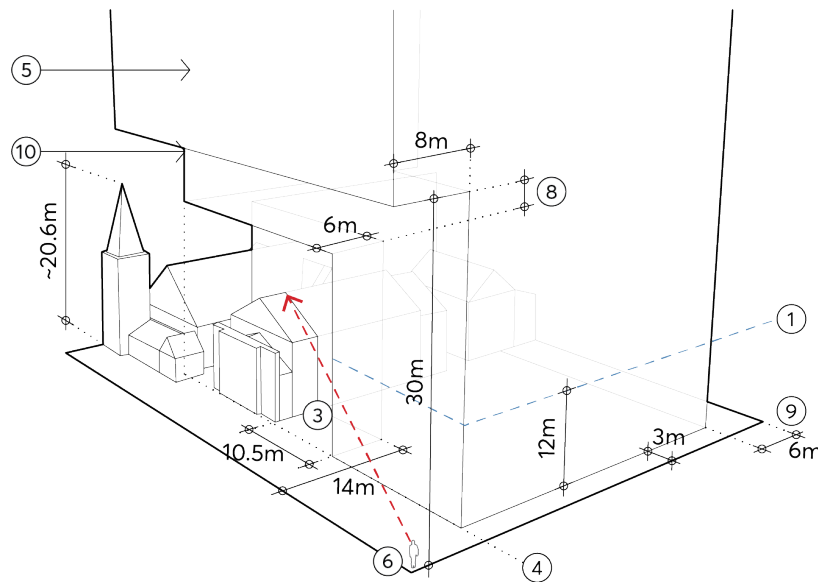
Existing elevations with new building guidelines (Source: TKD Architects with base drawing from Paul Davies)
